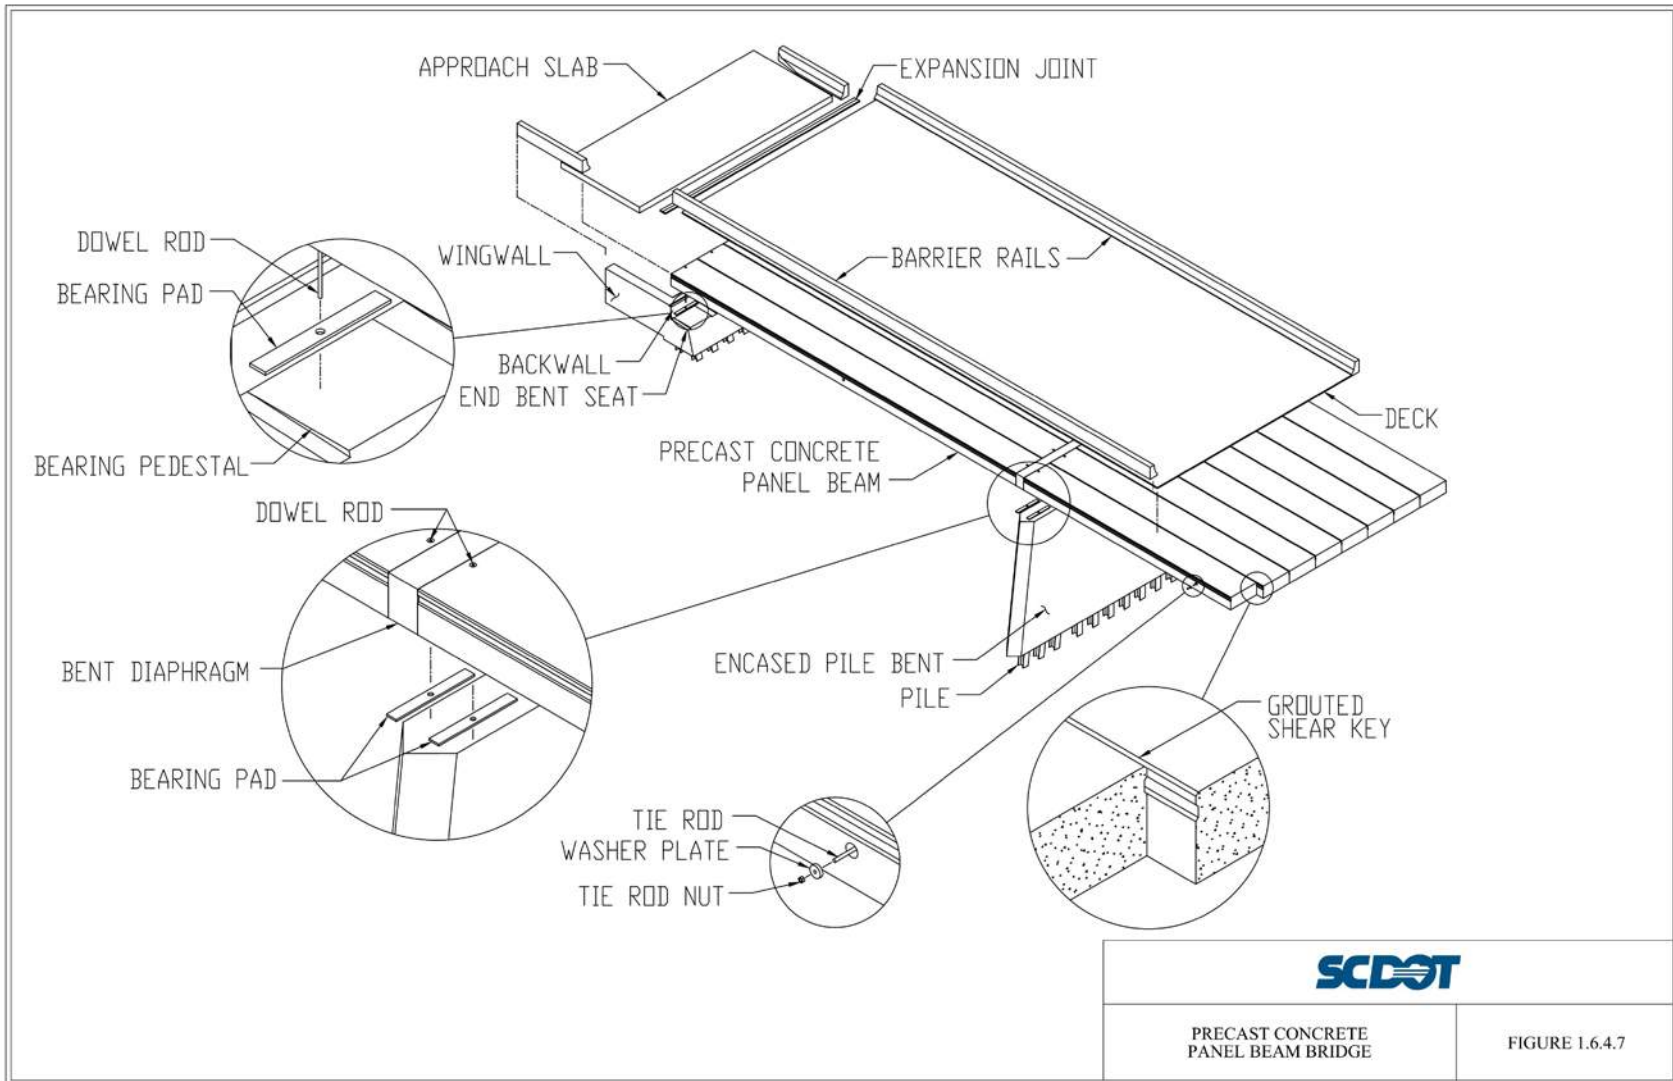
Precast Concrete Panel Beam Bridge Components
